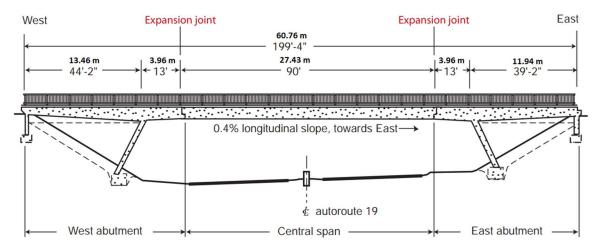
Elevation View of the de la Concorde Overpass from Autoroute (Highway) 19 [3]
